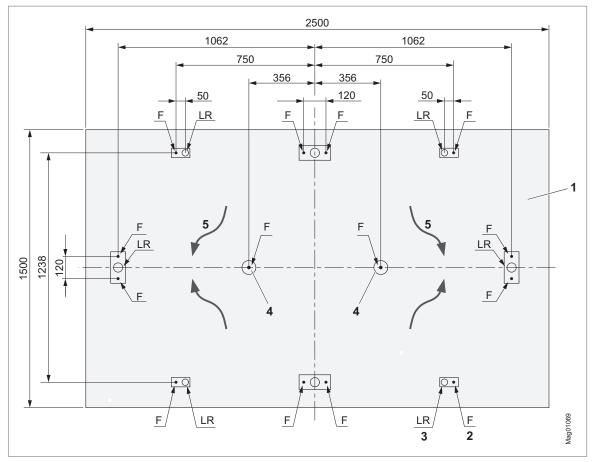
Foundation and empty conduit plan for base frame FURA T5 – side view (dimensions in mm)
